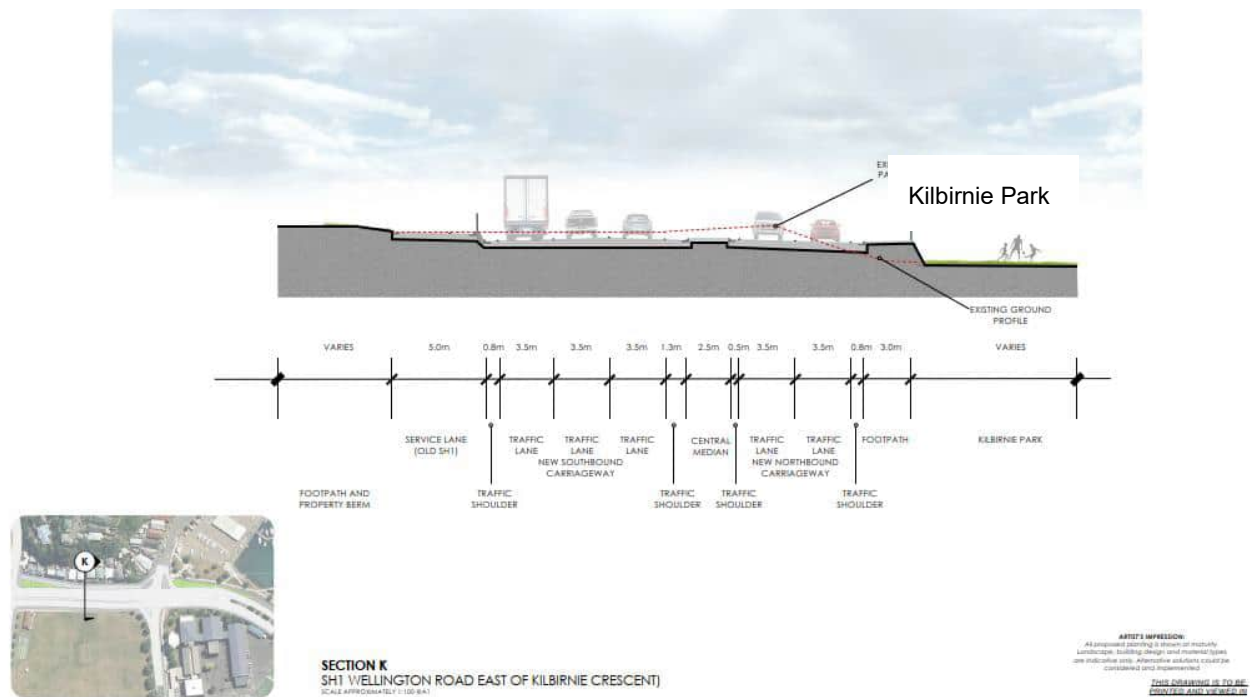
North-South schematic section of proposed SH1 expansion into Kilbirnie Park (from Cross Section K, SH1WI-DES-00-UDL-DGR Sheet 00511)
